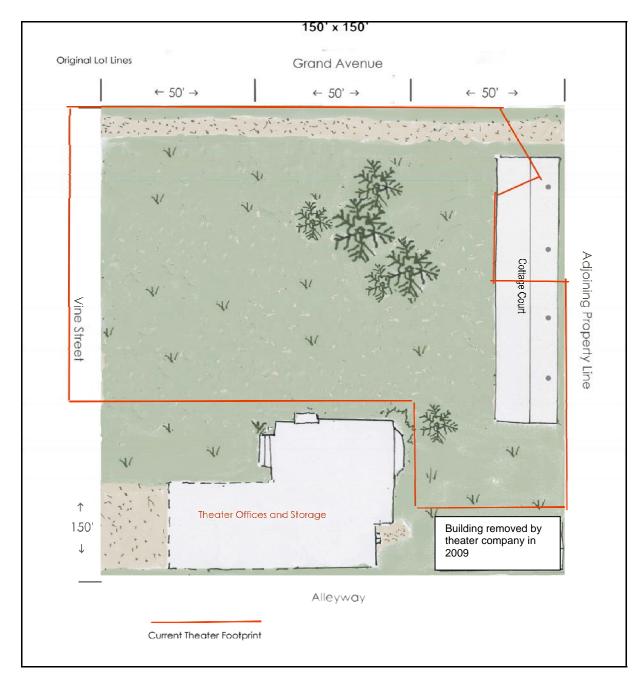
Sketch map of current building footprint at Cottage Court's original location
